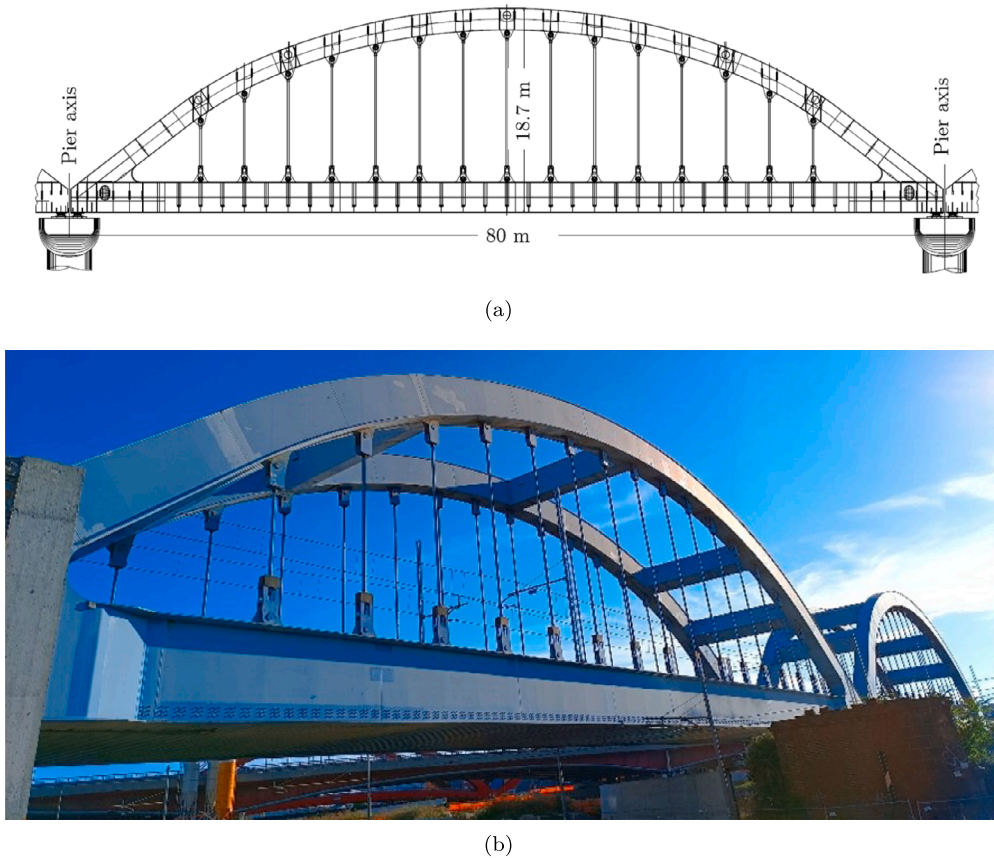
(a) Technical drawing and (b) view of the bridge.
